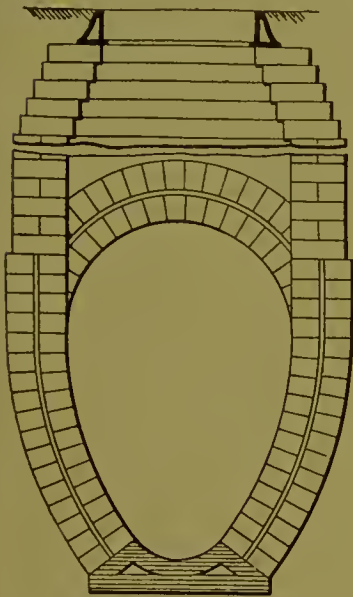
Manhole, on Sewer Invert Blocks. Cross Section.
